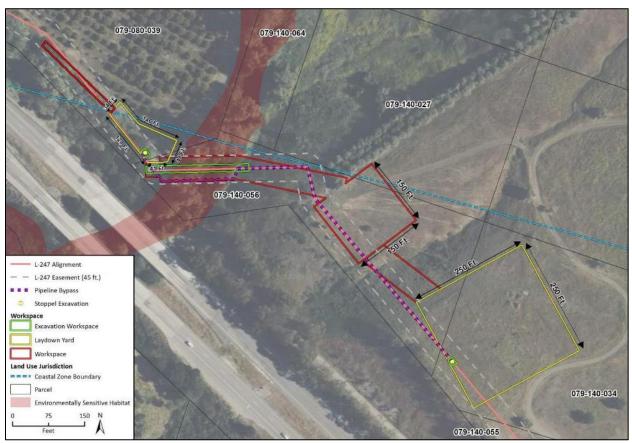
SITE PLAN SHOWING THE EXCAVATION AREA IN GREEN, LAYDOWN YARDS IN YELLOW, AND WORKSPACE IN RED.
